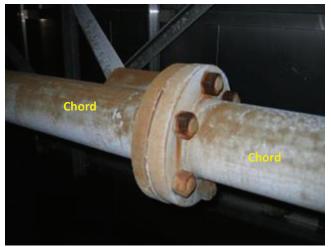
Loss/Breakdown of galvanizing with corrosion of the chord, splice plates, and splice bolt nuts
